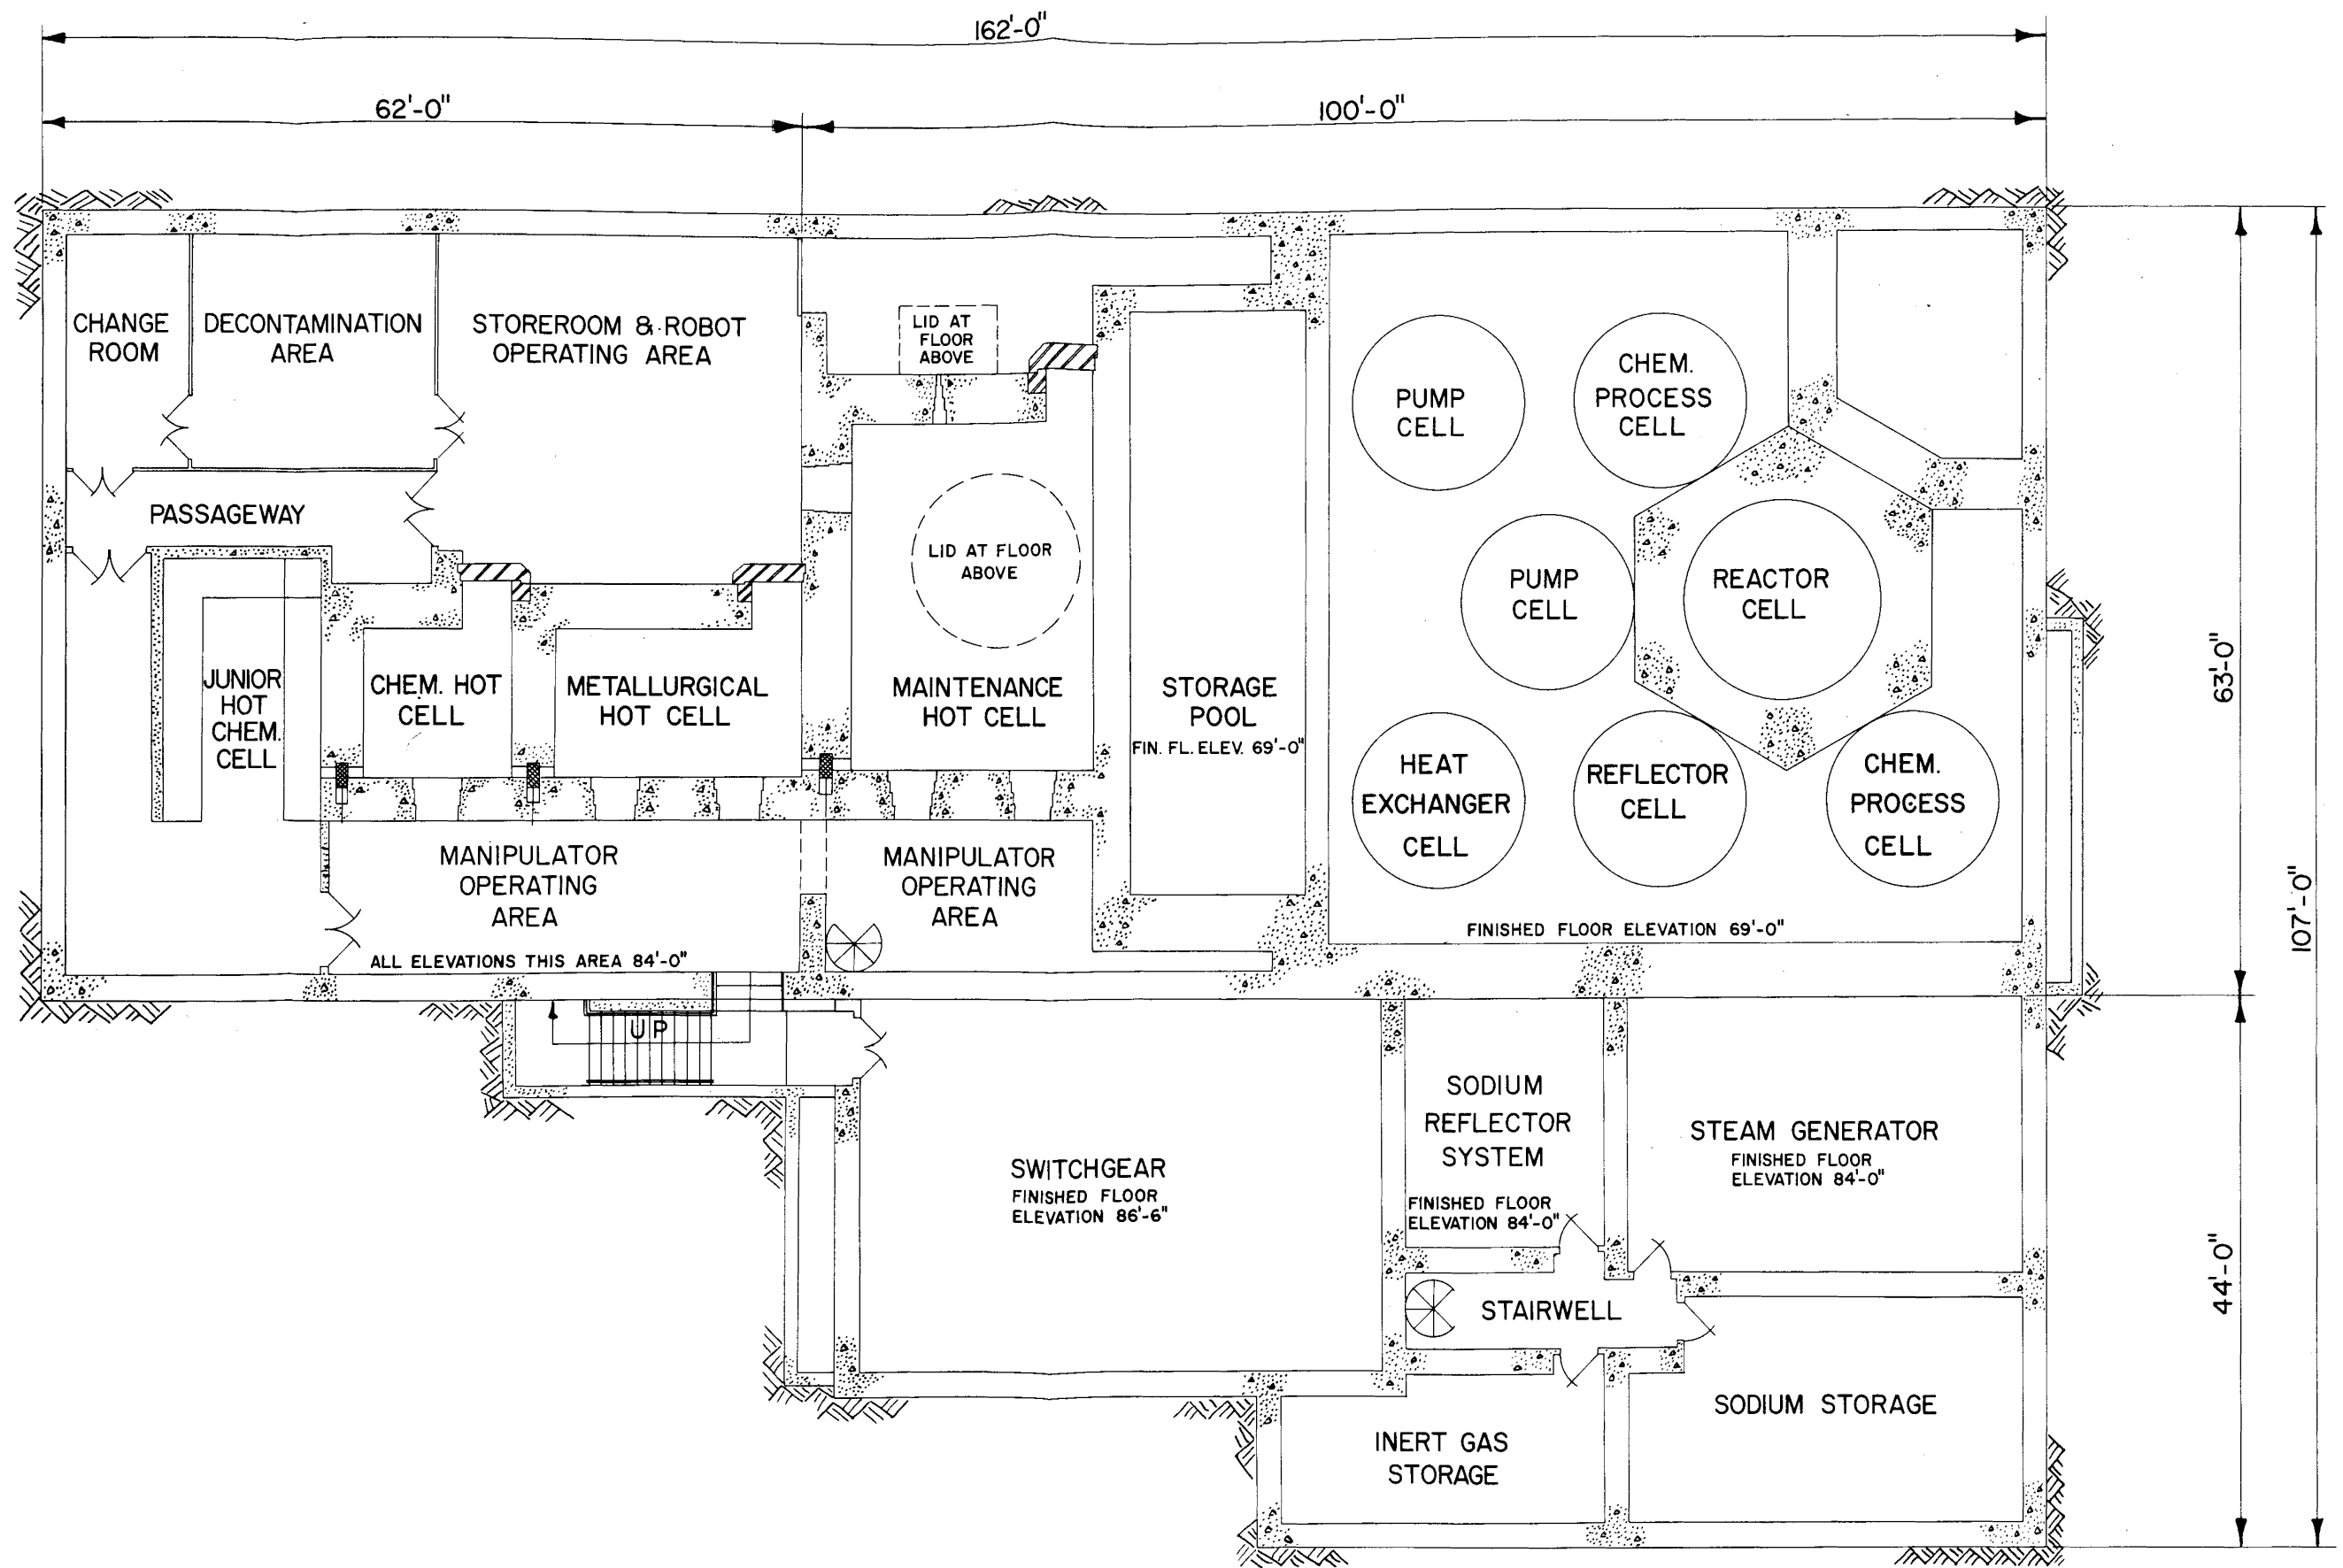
FIRST LEVEL BASEMENT FLOOR PLAN
